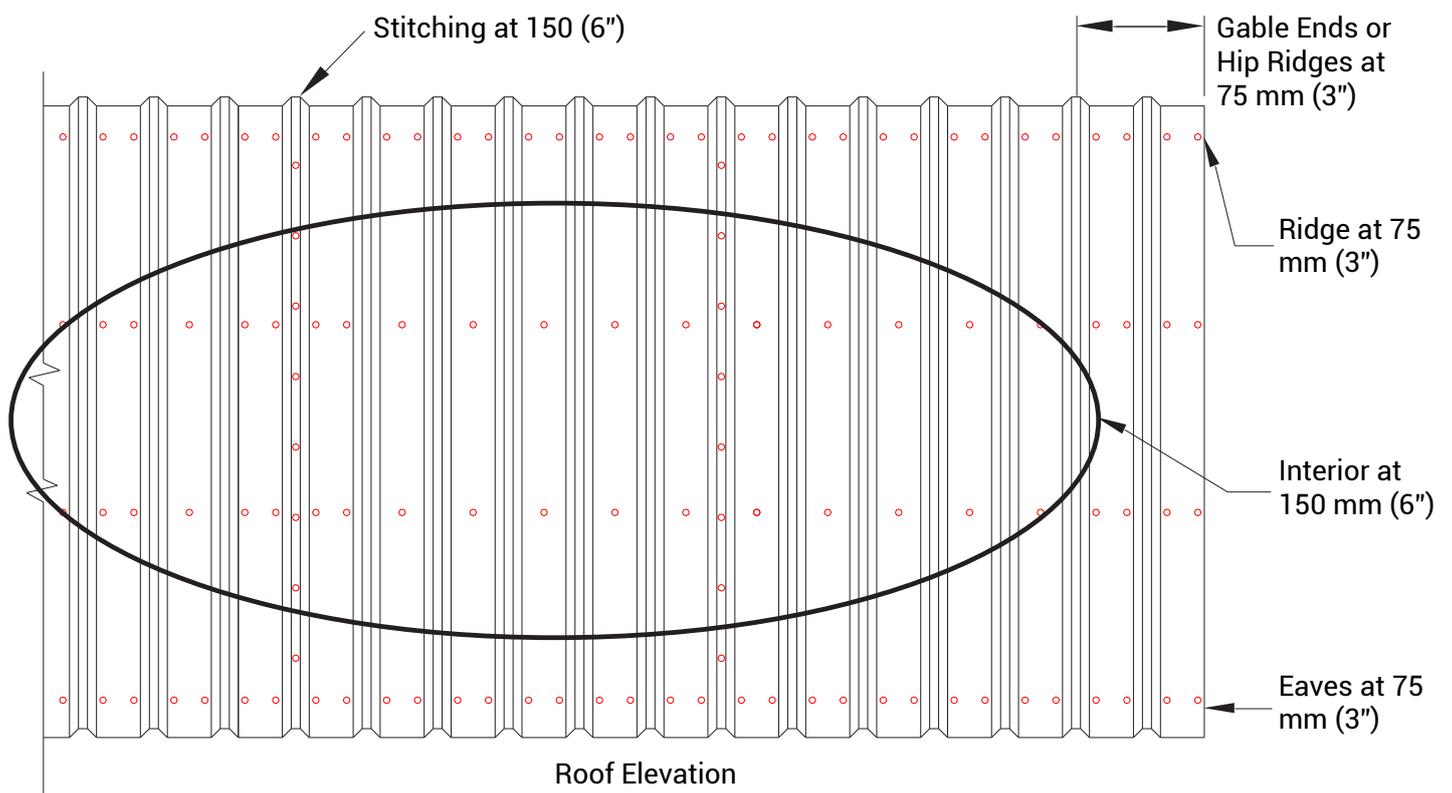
Sheeting Connection Separation. Own elaboration based on: Caribank, 2018.
